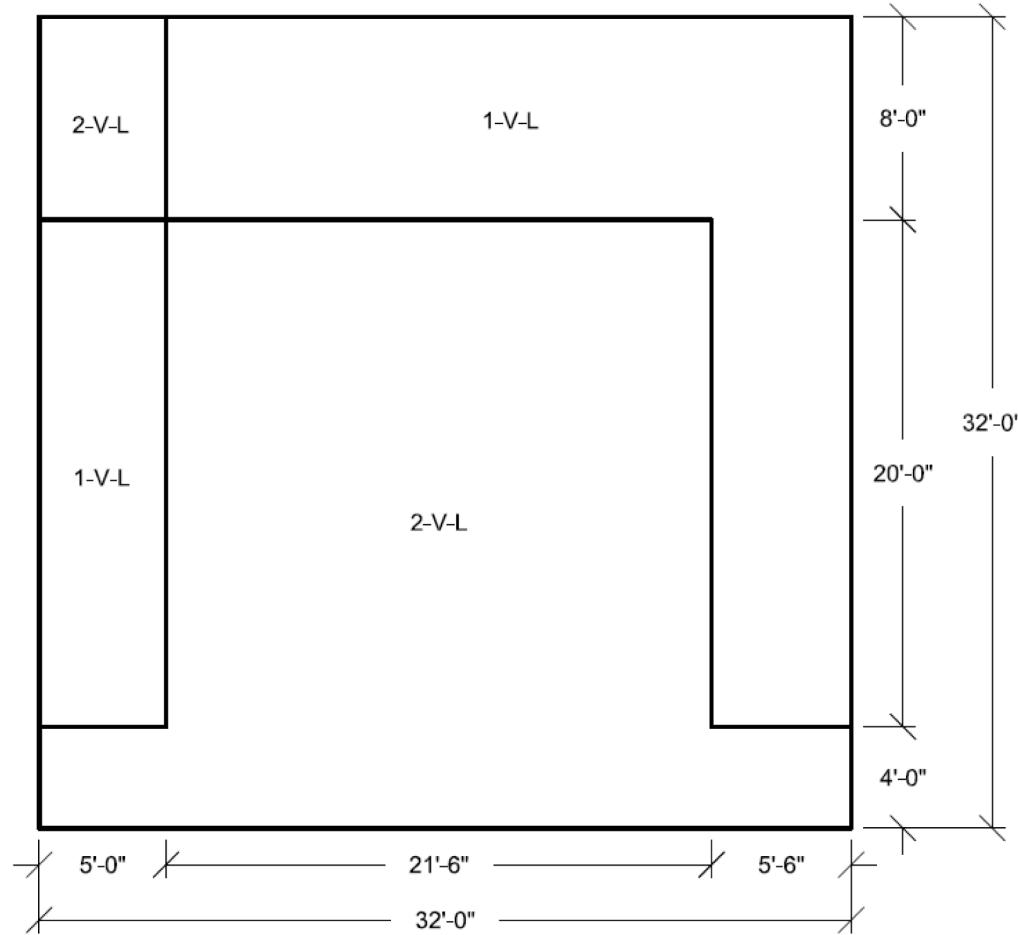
H.6-191 DGFOSV Wall 13 Looking From Outside Vertical Reinforcement Zones Near Side Face
